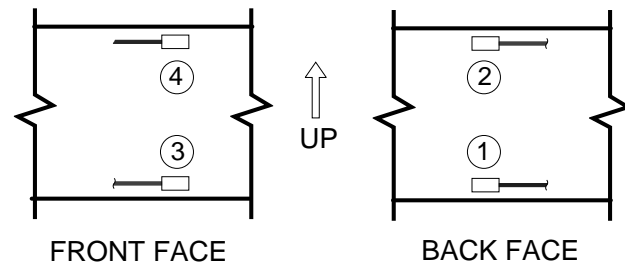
Strain Gage Locations and Numbering for Beam Strain-Gaged Sections at 2nd Floor Beams
